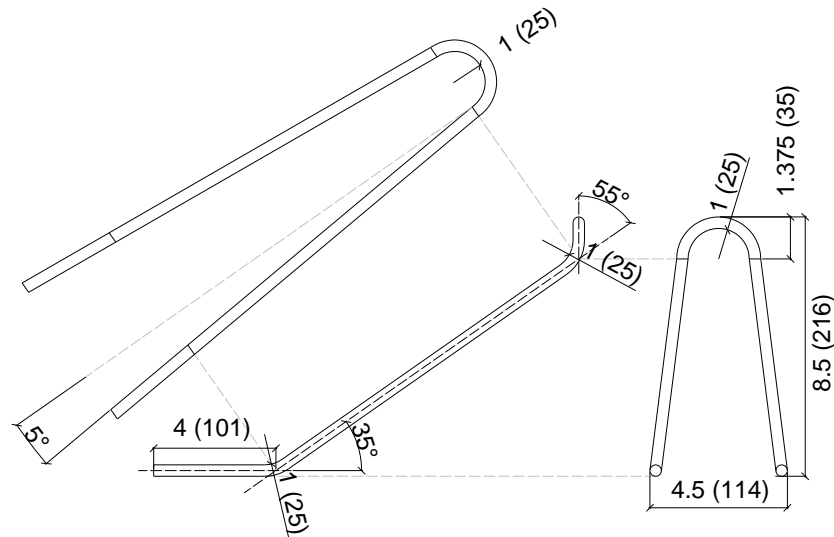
Inclined Working Member Geometry; Novel Shear Reinforcing System [in. (mm)]
